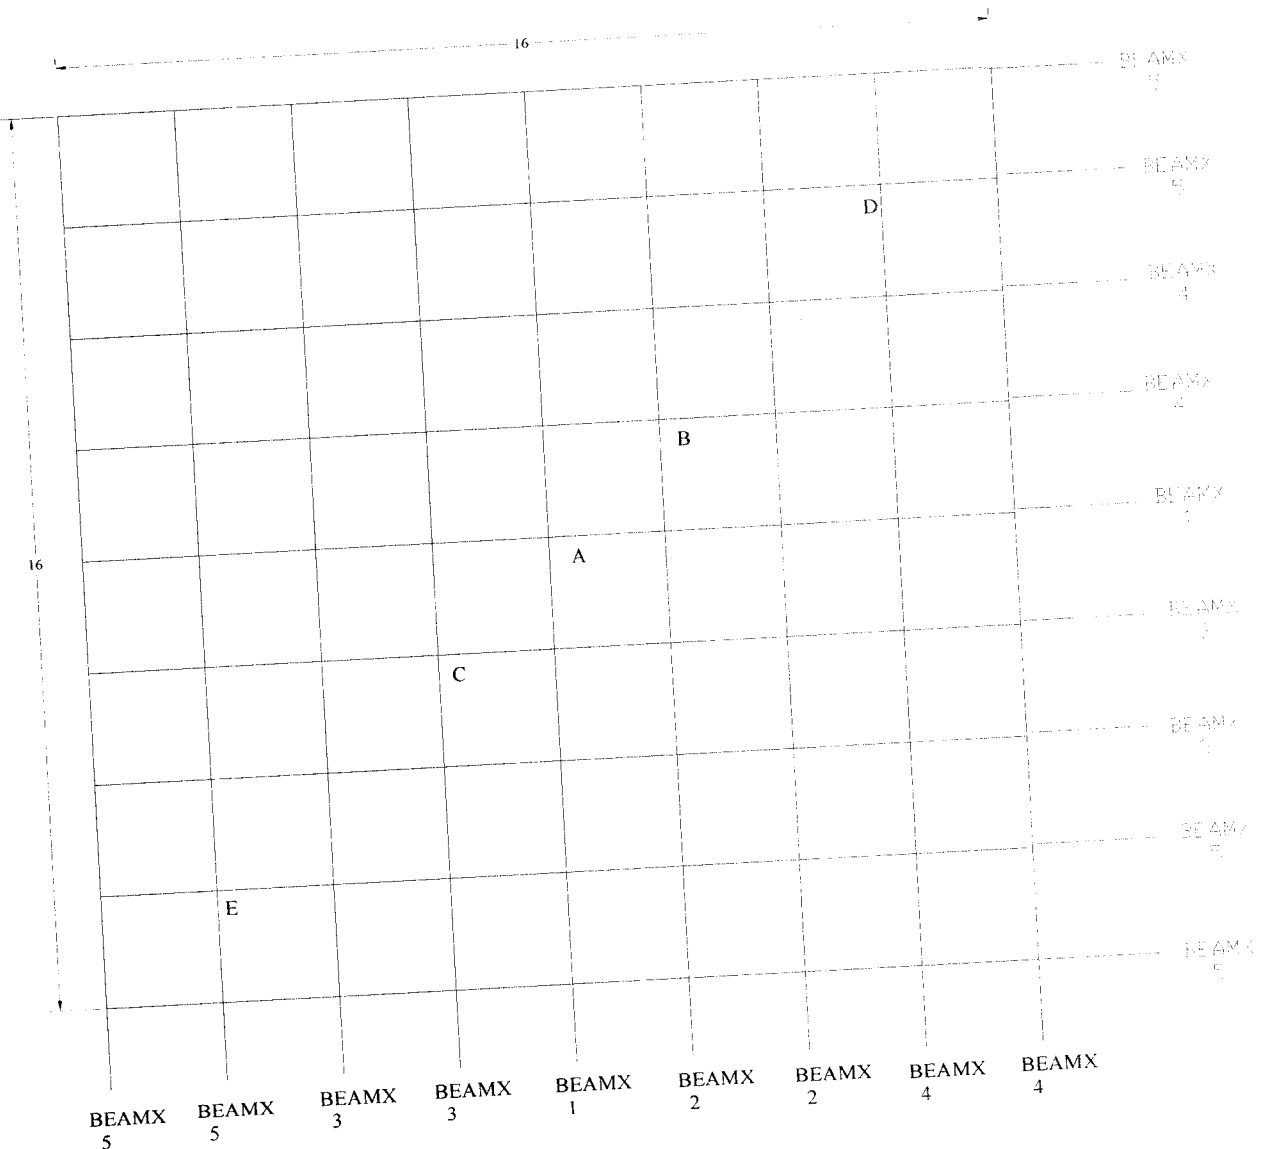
BEAMS FOR GRID FLOOR OF SPAN 16m
